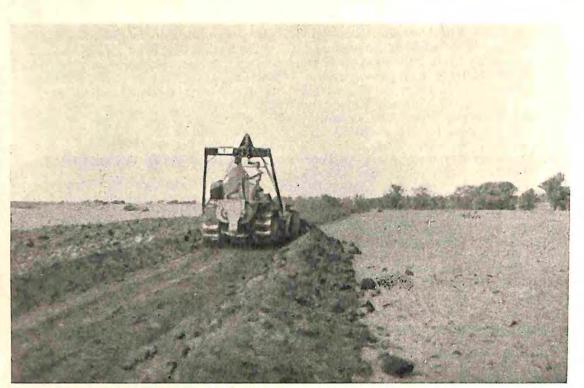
Rear view of the angledozer on the first cut following ripping.
